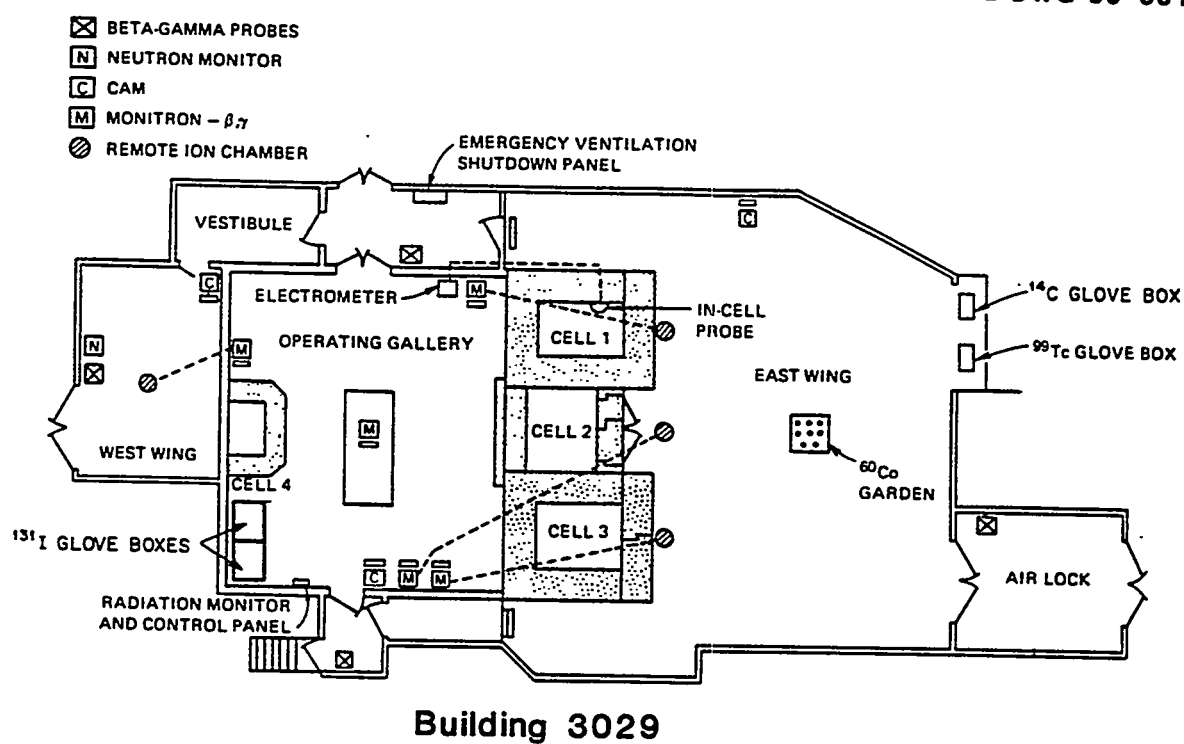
Floor plan Building 3029— Source Development Laboratory.
